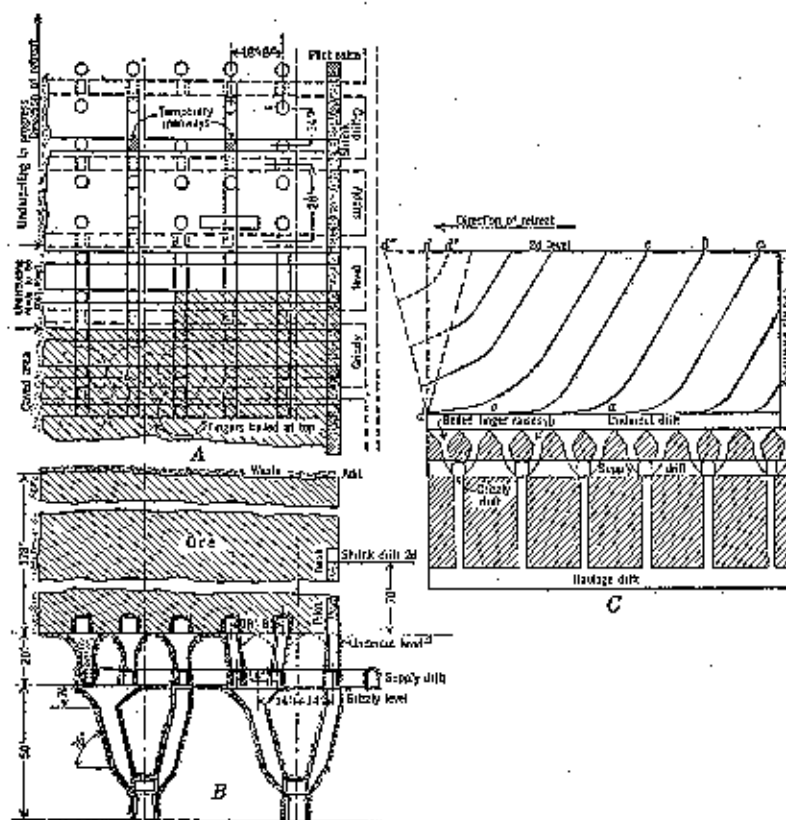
Standard block-caving system, Humboldt mine, Morenci, Ariz.: A, Plan of undercutting level and grizzly level (dash lines); B, vertical cross section; C, typical section showing progressive stages of caving.
